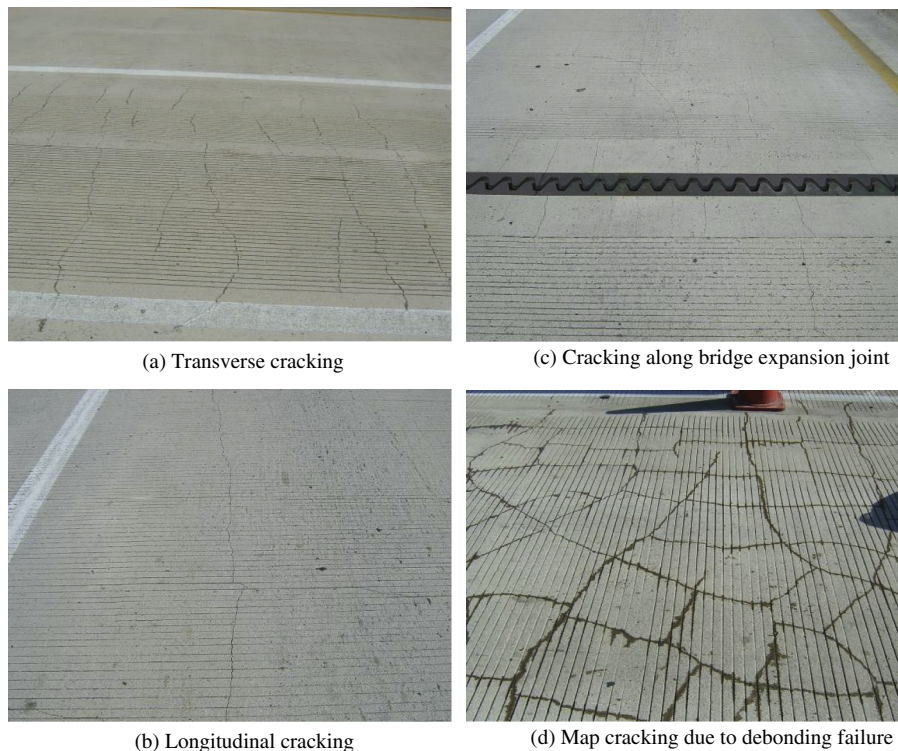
Cracking examples of VES-LMC in repaired bridge deck.
